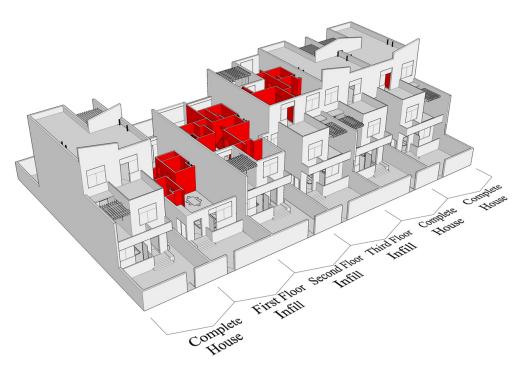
A townhouse solution can use MODULES and INFILL or FIT-OUT for customized interior layout and equipment.
